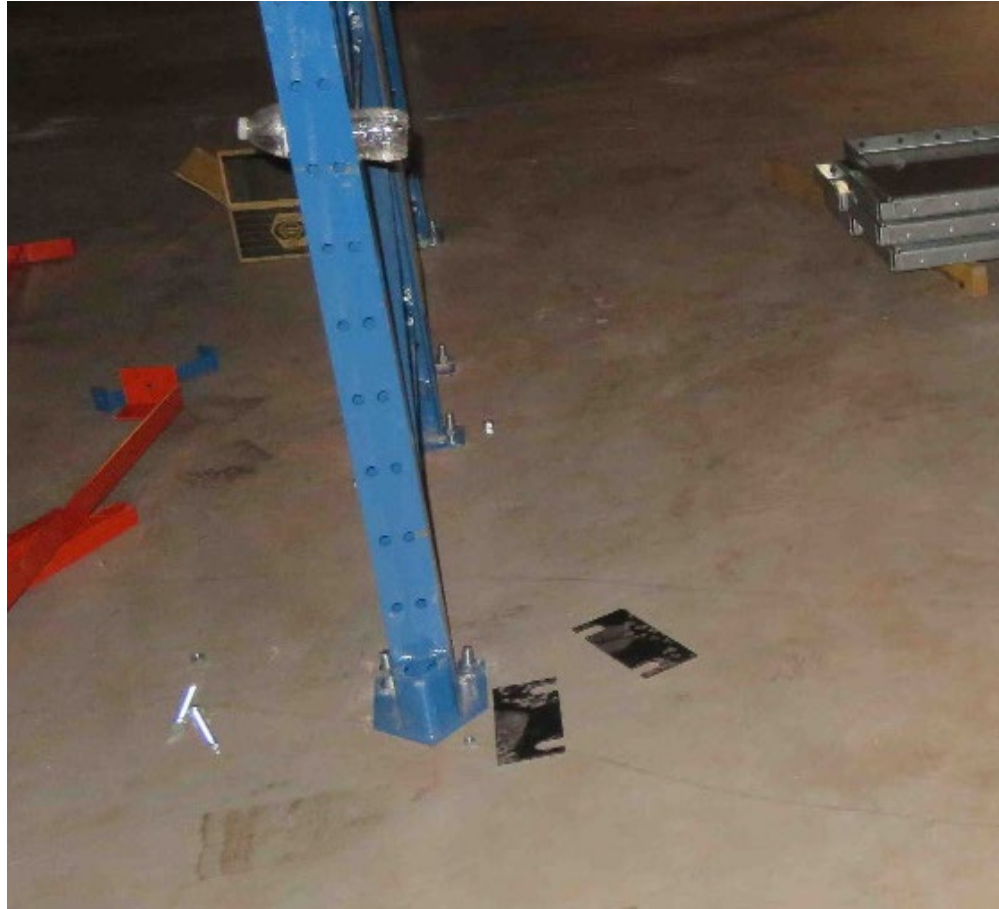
Levelling shims on the floor near metal upright where workers were installing racks.
